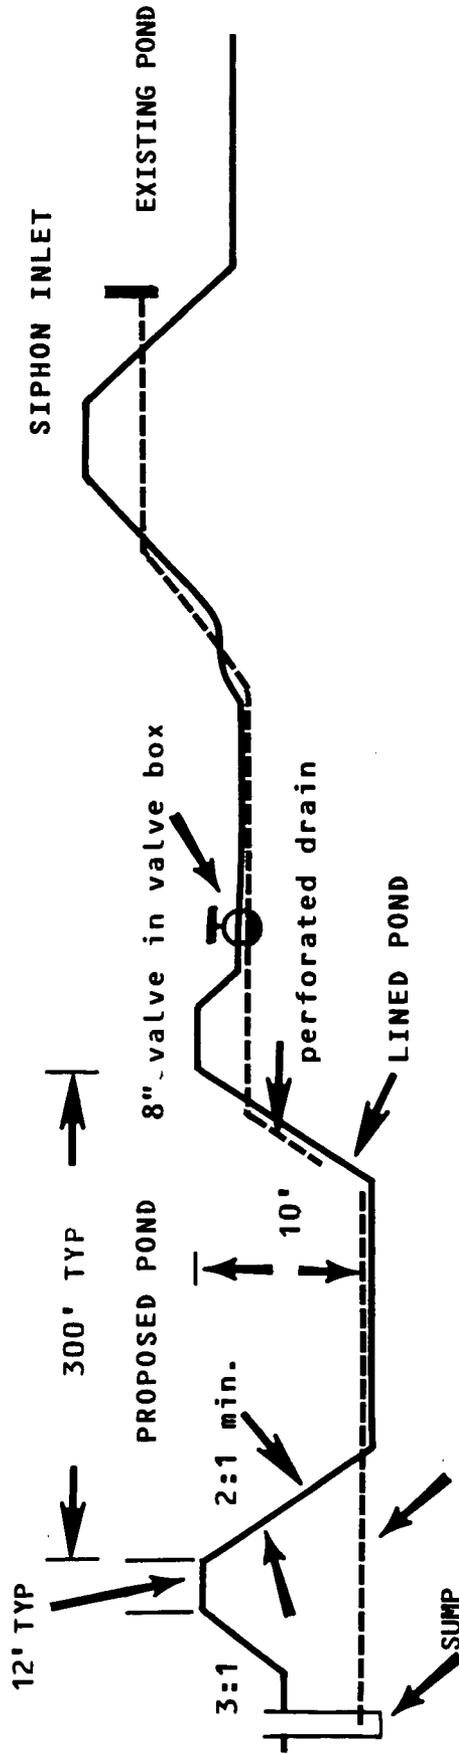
A. Generalized cross-section showing some of the dimensions of the proposed pond, detail, and transfer system of fluids from existing pond to proposed pond.
